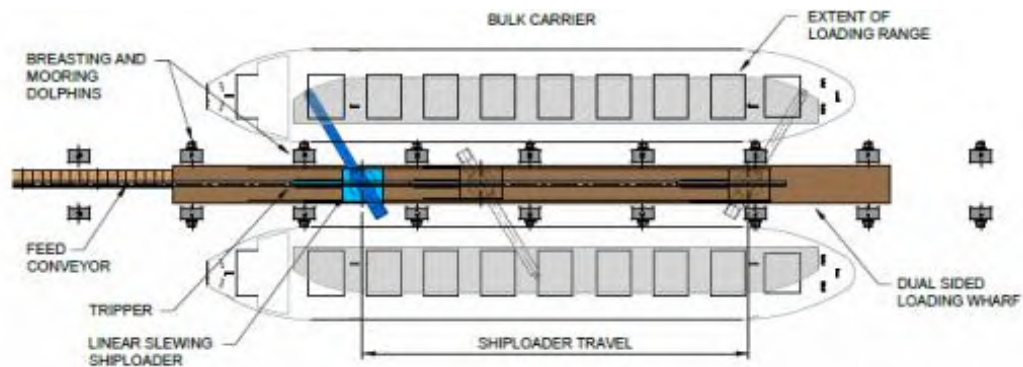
Double-sided pier and slewing shiploader (Source: AECOM)
